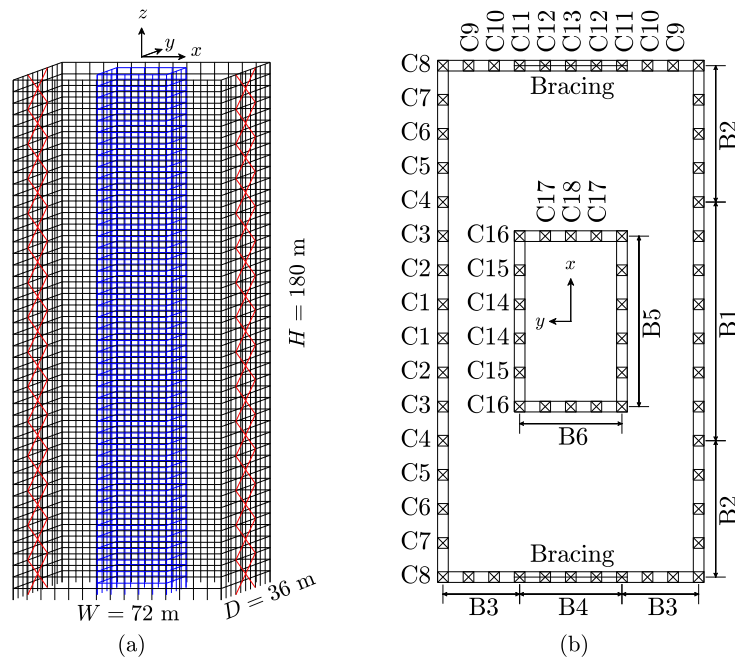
Illustration of the structural system:(a) 3D view; (b) typical grouping of the beams (groups B1 to B6) and columns (groups C1 to C18) in plan.
